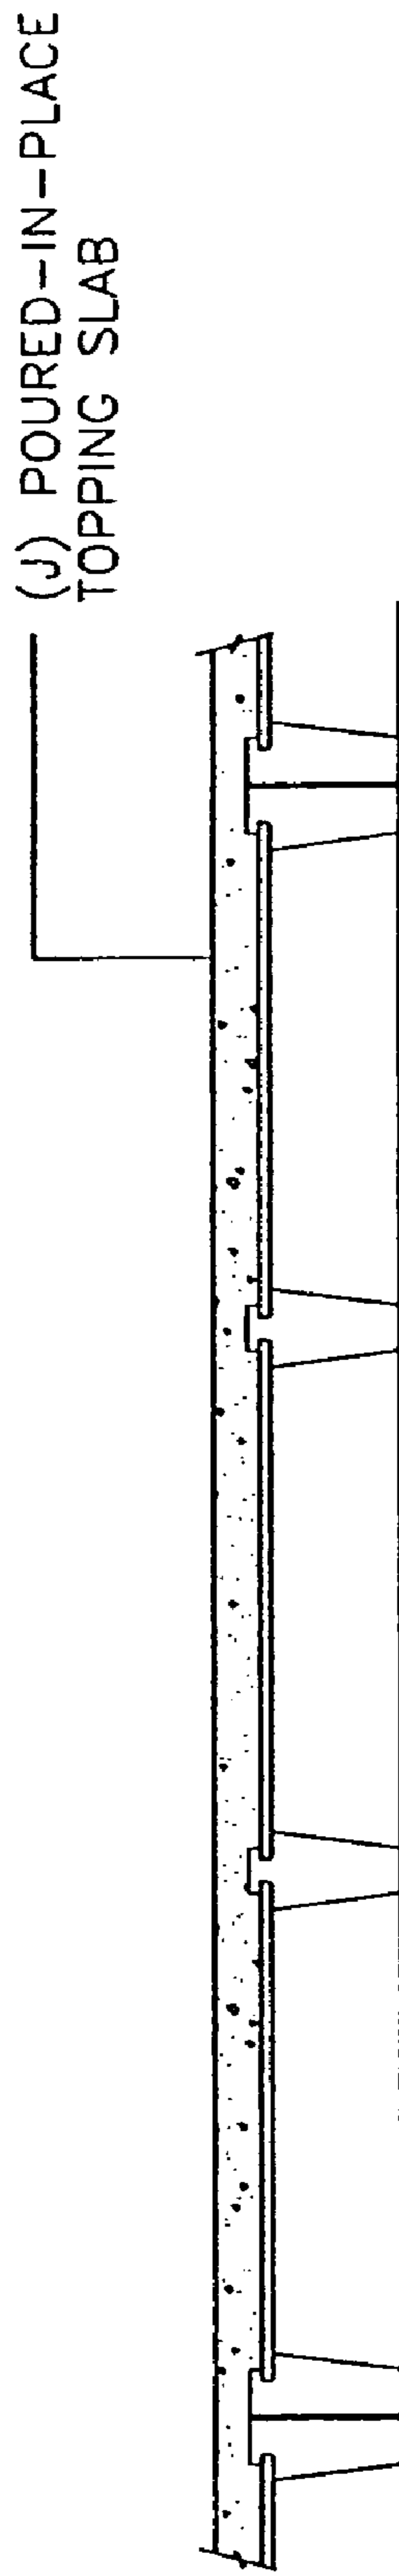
SECTION FINAL FLOOR ASSEMBLY
